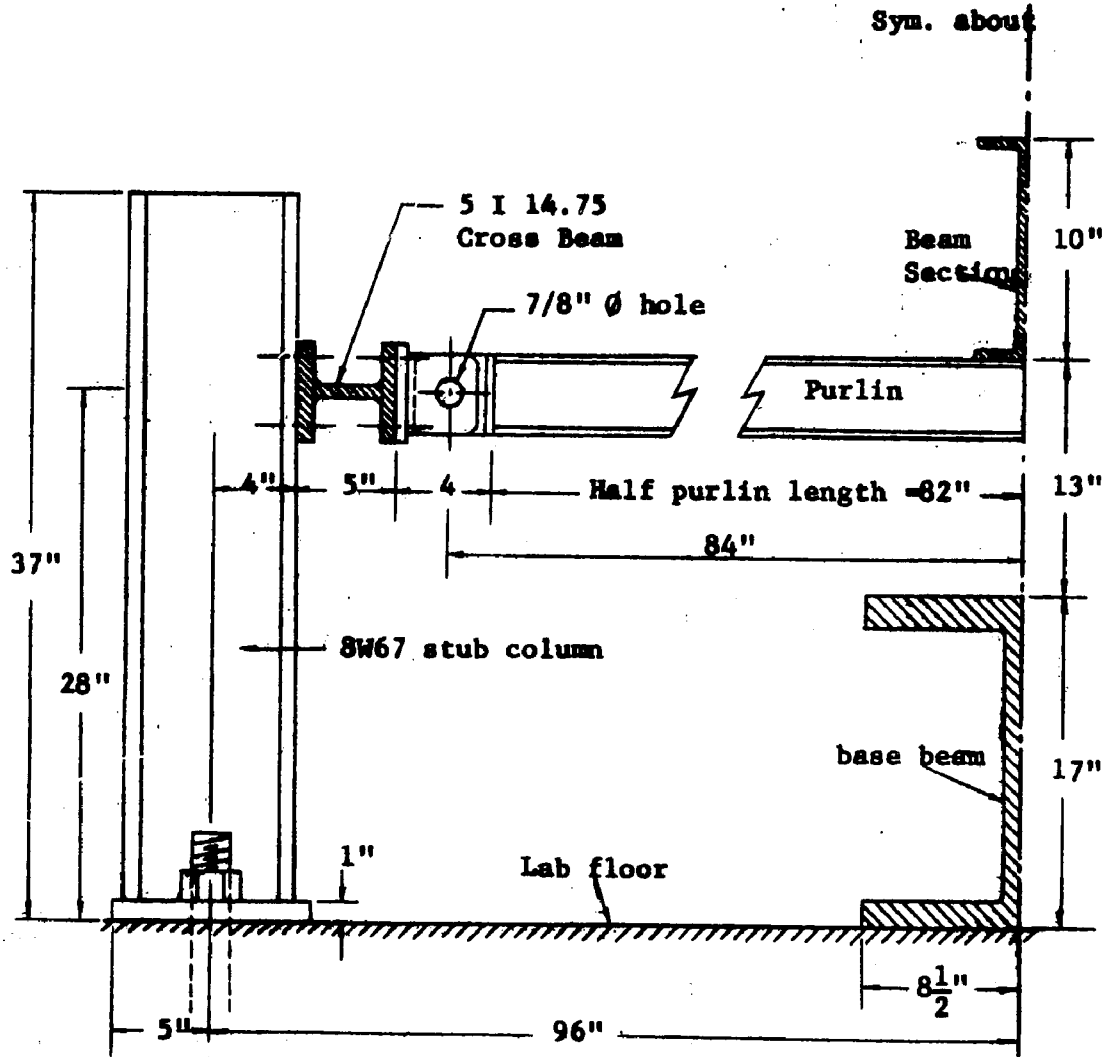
(b) SECTION VIEW OF THE BEAM-PURLIN ASSEMBLY
